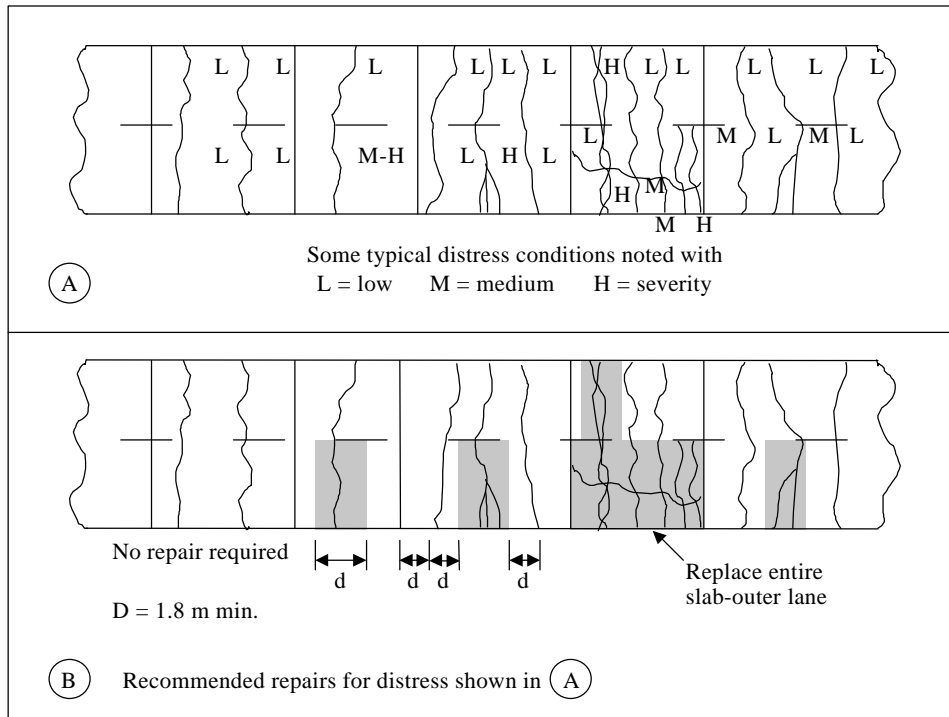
Repair recommendations for jointed reinforced concrete pavements (JRCP).
